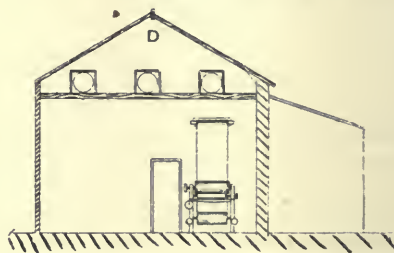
END ELEVATION OF PAPER COATING ROOM.
